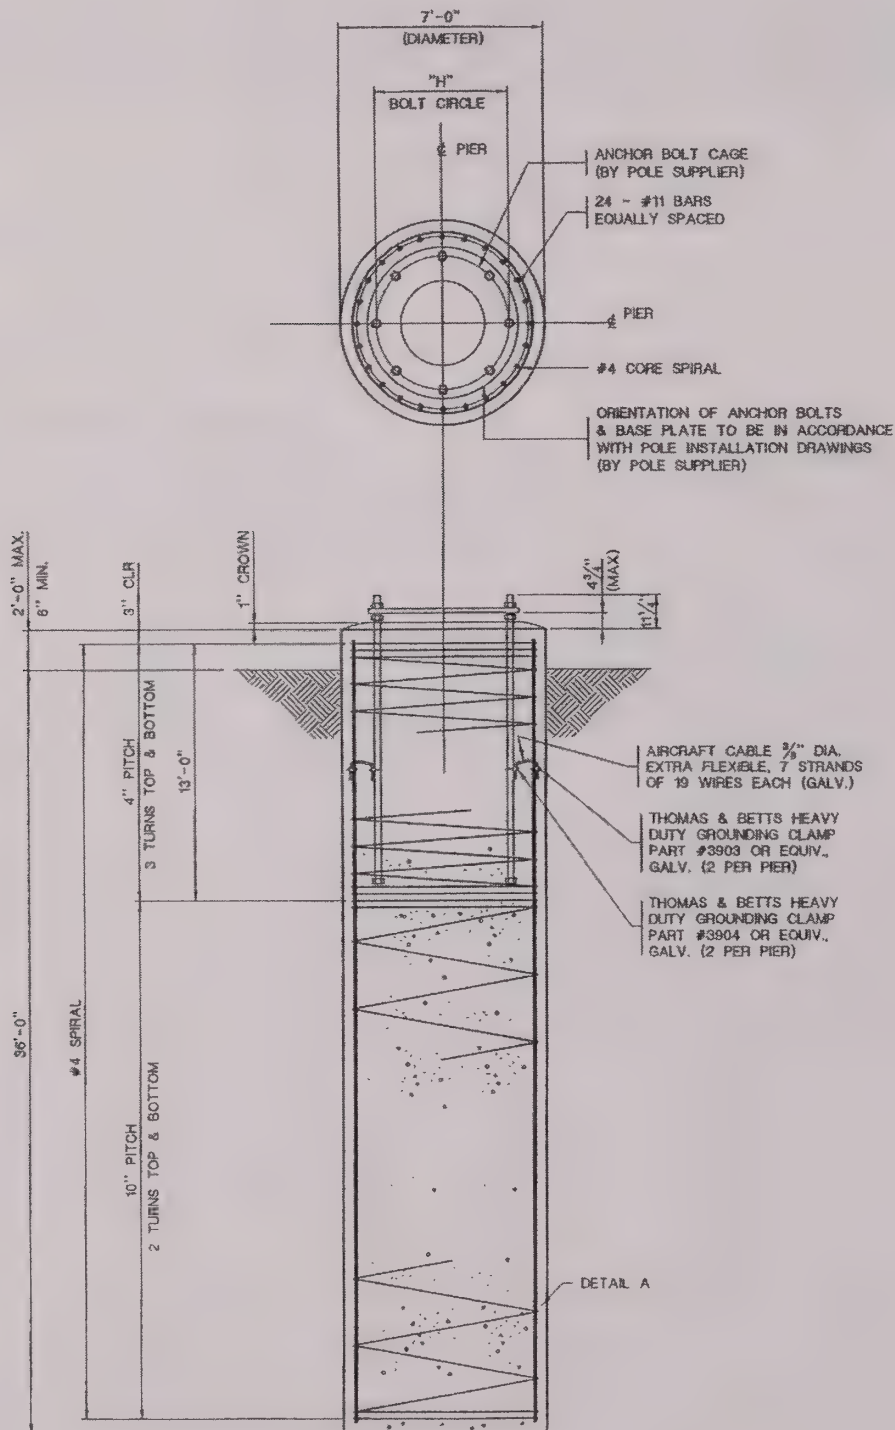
TYPICAL FOUNDATION DESIGN FOR TUBULAR STEEL POLES
